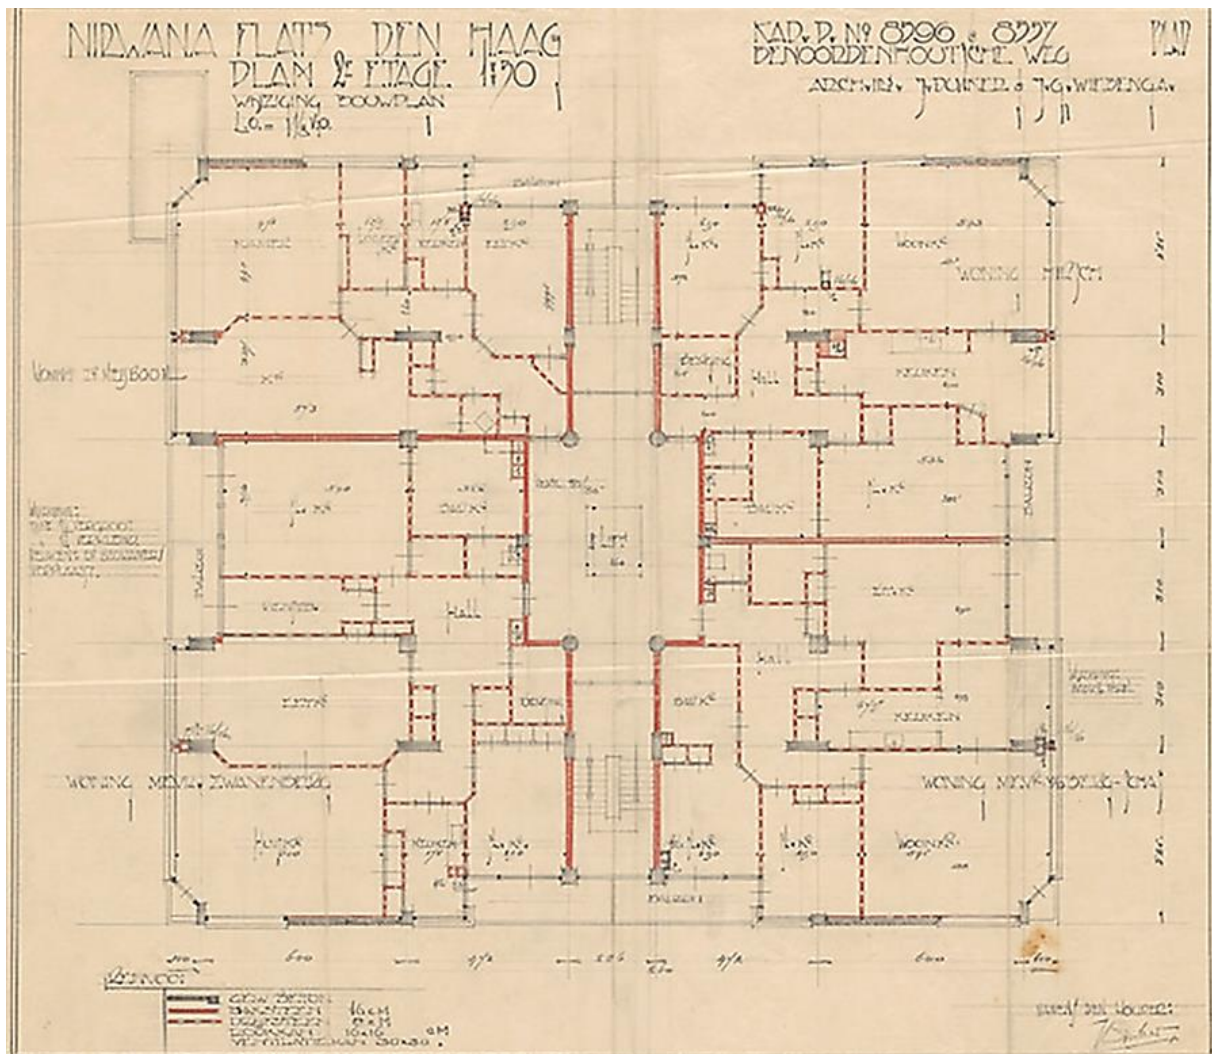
Plan second floor Nirwana-flat, Duiker, 1927.
